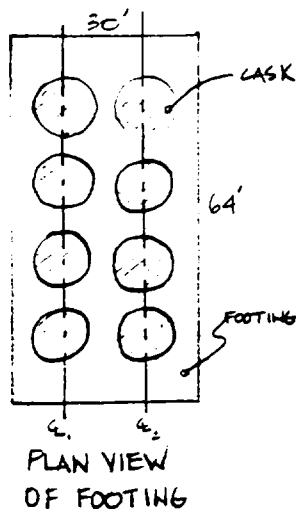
DETAIL OF FOOTING CONFIGURATIONSFOOTING LOAD / PRESSURE
